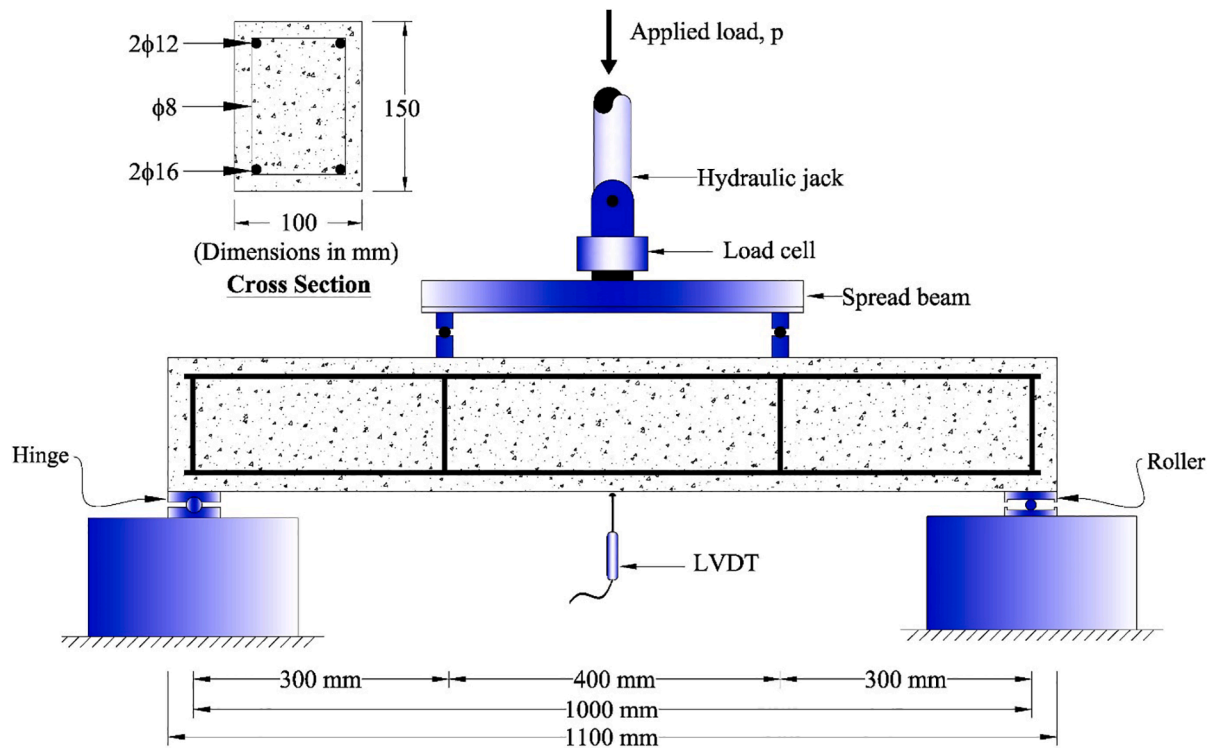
Specimen dimensions, load setup and reinforcement details [39].
